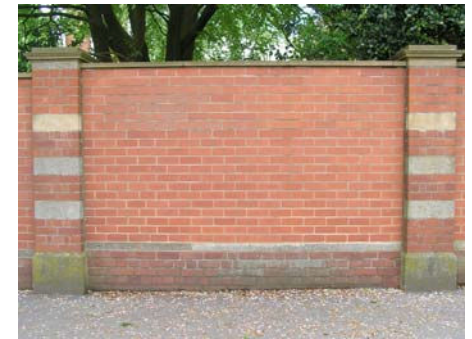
Detail of the boundary wall along Bishopthorpe road
